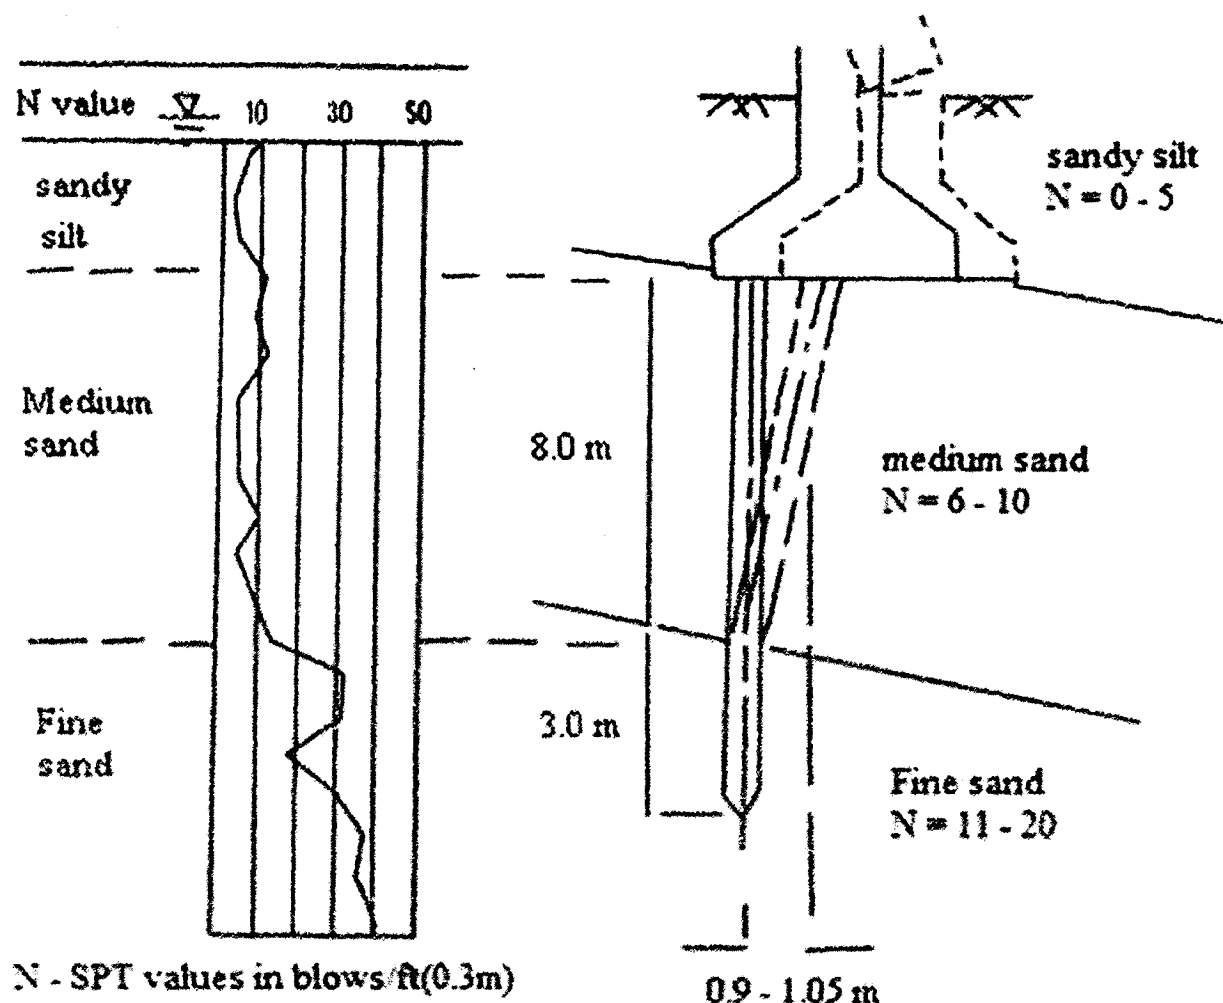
Failure of Yachiyo Bridge (Hamada, 1992)
